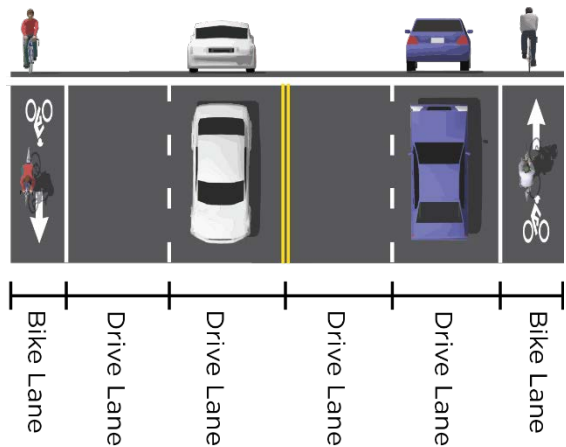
Potential El Portal Drive Cross Section - San Pablo Ave to Glenlock St
